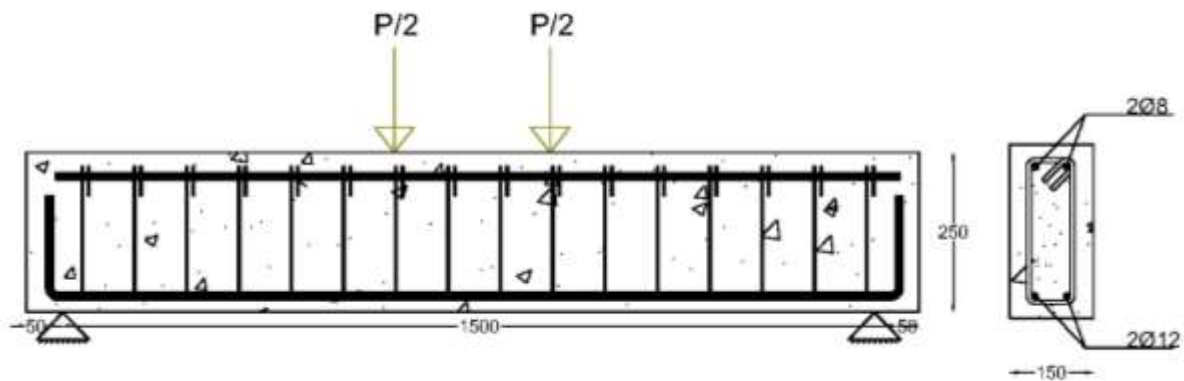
Product details for the test: Dimensions and reinforcing details (all dimensions in mm) .
